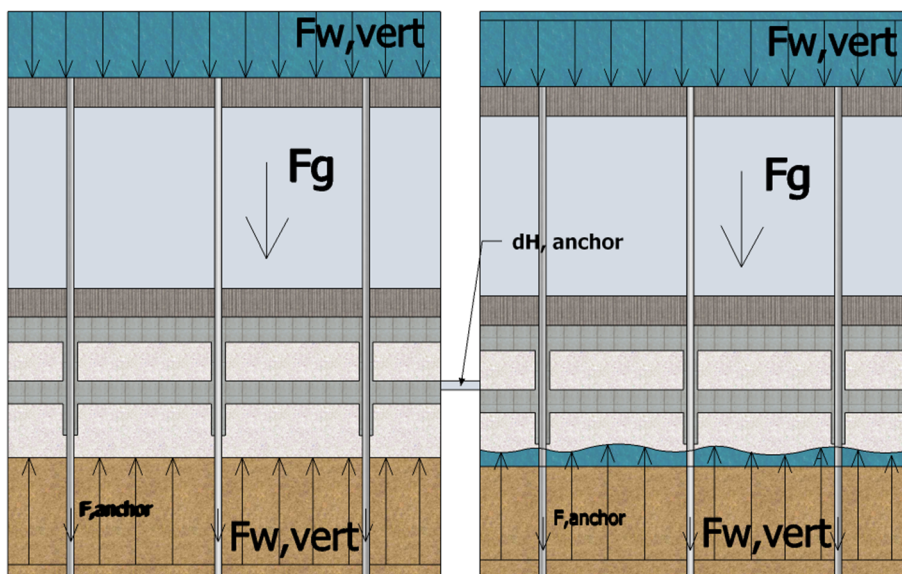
Settlement of element after collapse of bottom EPS layer, using grout anchors
